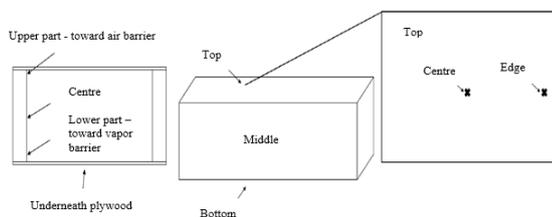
Location of HygroTrac sensors, timber framed- (left side) and laminated timber elements (right side).
